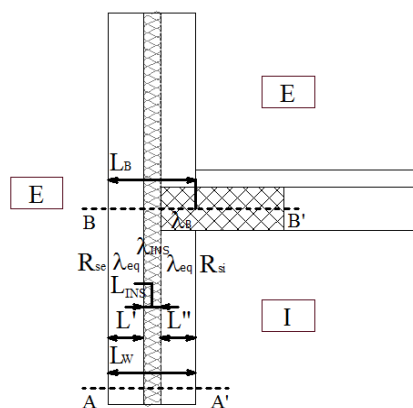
External wall insulated in the middle with floor and insulated beam
